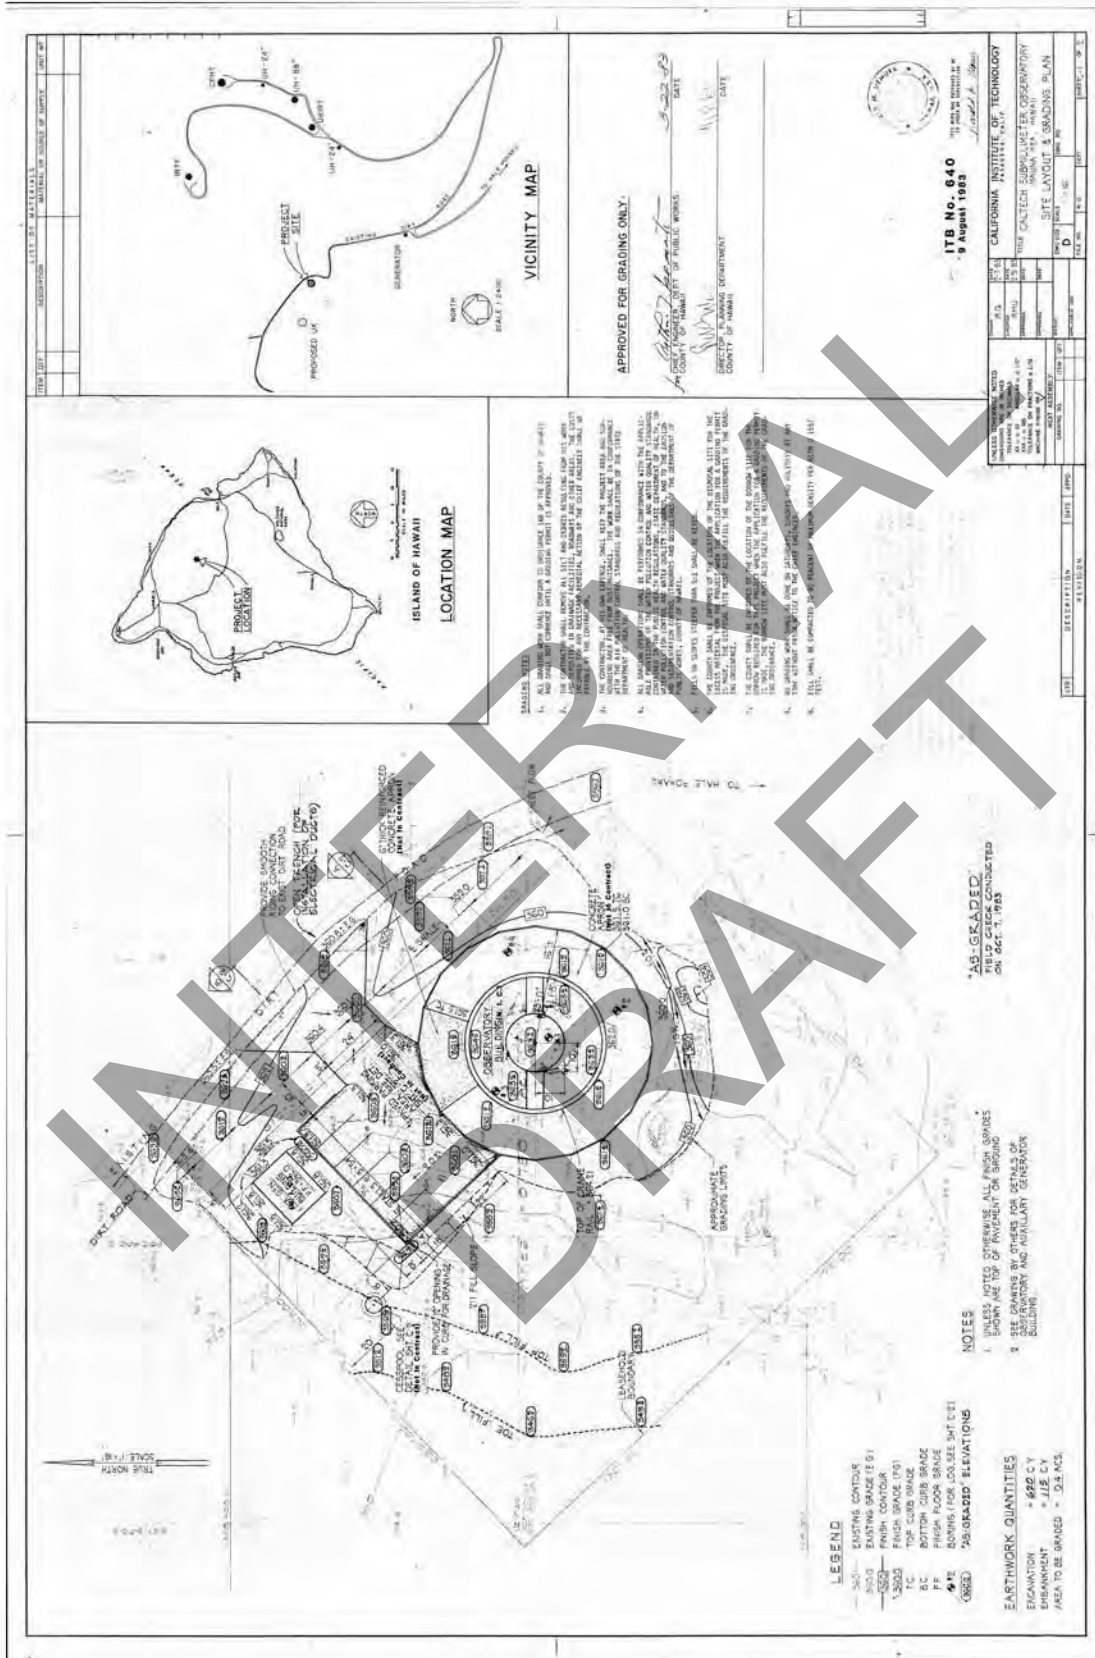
Site Layout and Grading Plan, 1983-02-07.
